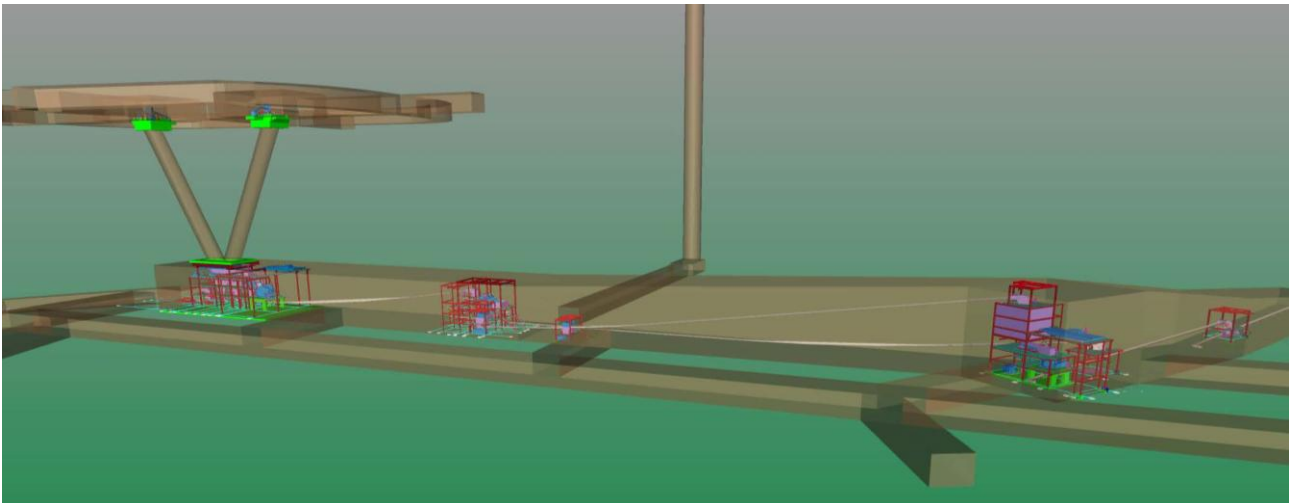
South Crushing and Screening Arrangement within Underground Chambers
